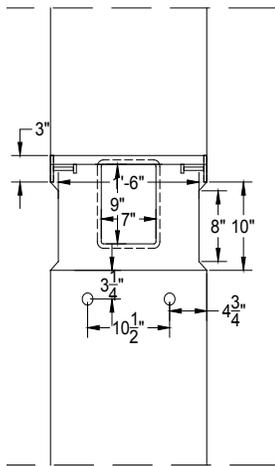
Precast Column Elevation (in. = 2.54 cm)
